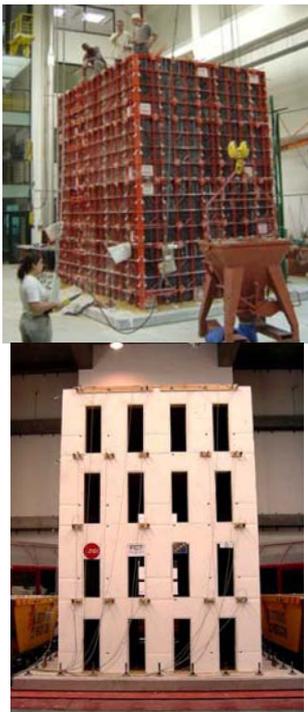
Scale models of typical old buildings of Lisbon to be strengthened [Ref. 14]
